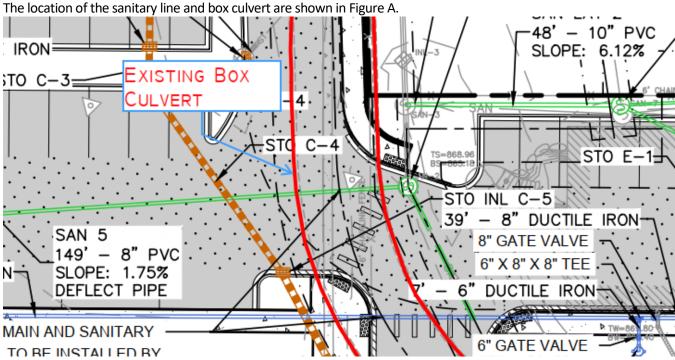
Figure A: Partial site plan showing location of sanitary line and existing box culvert. Site plan provided by JSD Professional Services
